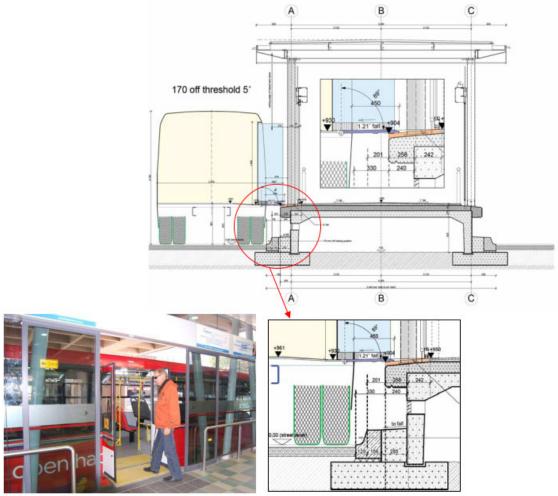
Detail regarding the boarding bridge used by trunk buses when docking at stations
